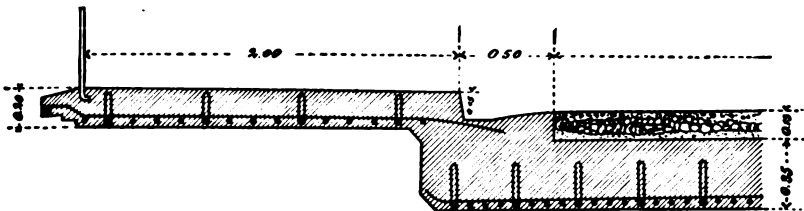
Laufbach Bridge in Laupheim. Longitudinal section showing thoroughfare.
